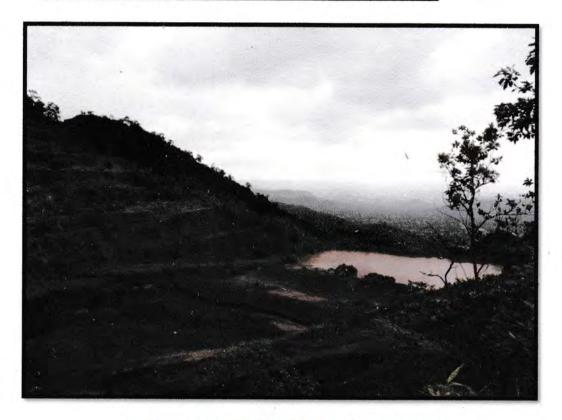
Dams at the slope of Fines Heap (Dams 1-5)& 04 no.s' of Sedimentation Traps
